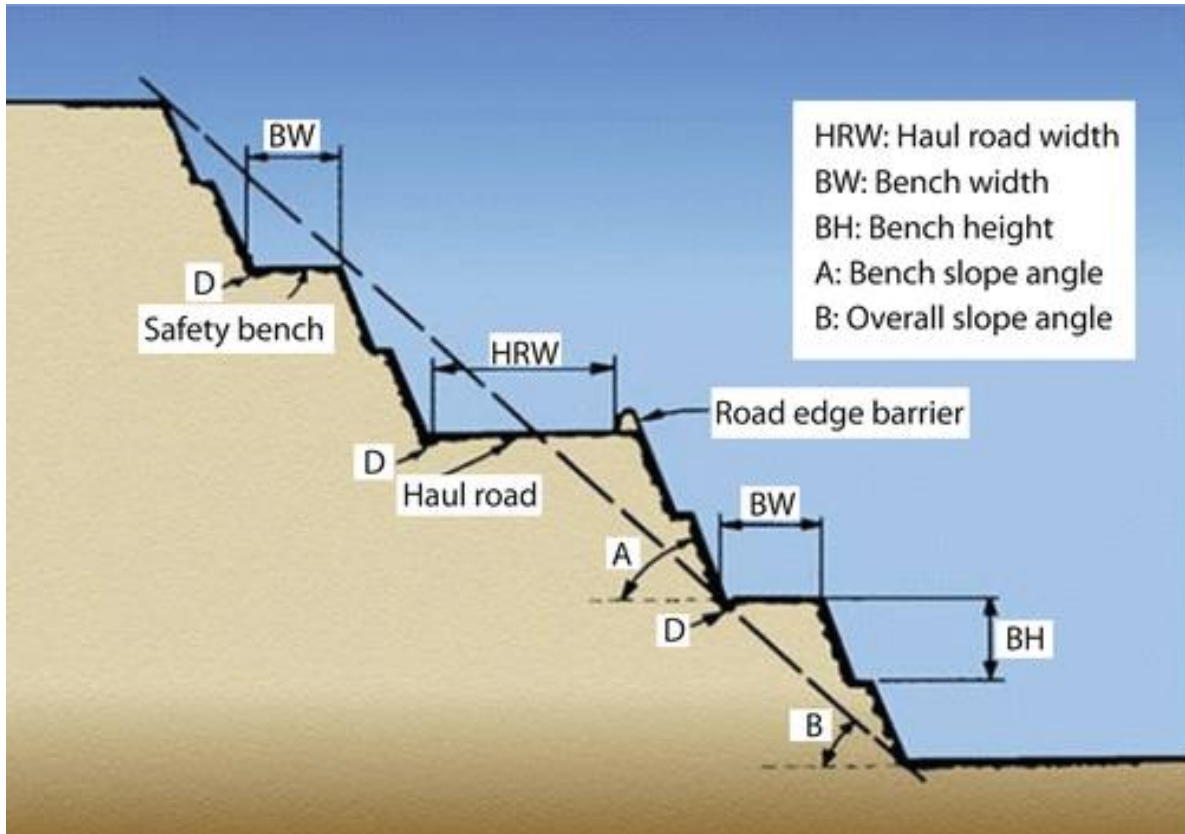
Inter-relationships between bench geometry, inter-ramp slope angle, and the overall slope angle. (Wyllie & Mah, 2004)
